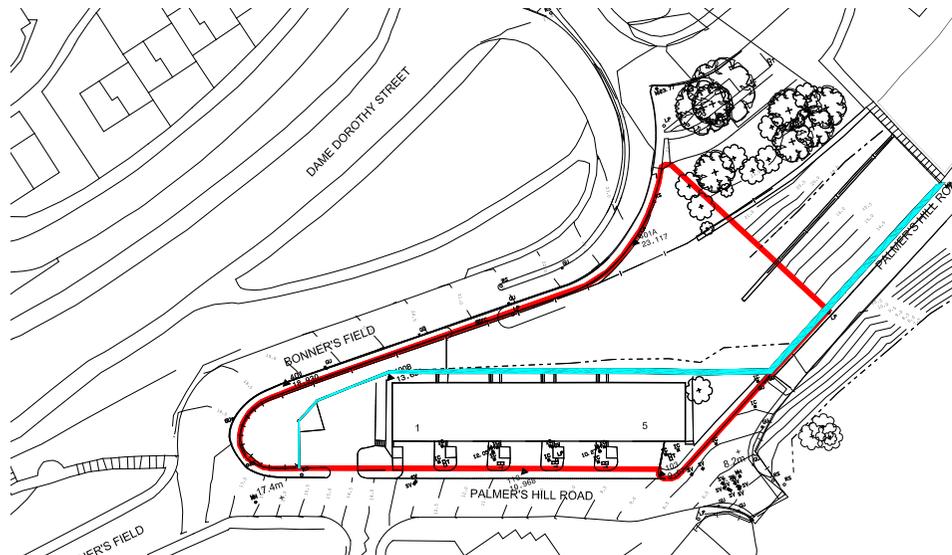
Site Plan showing the sit boundary line in red and the existing retaining wall in cyan
